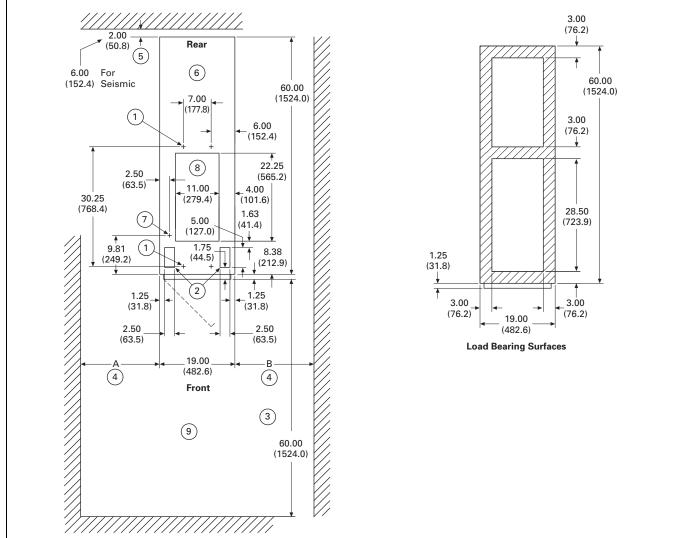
MEF 19.00-Inch (482.6 mm) Wide Pull Section Floor Plan
